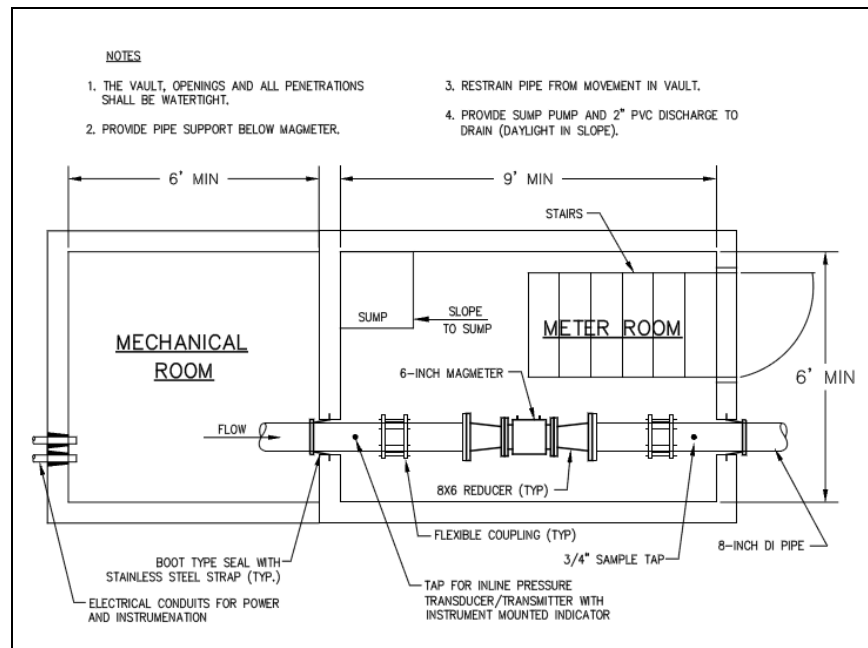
Stadium Well – Proposed Meter Pit Layout
